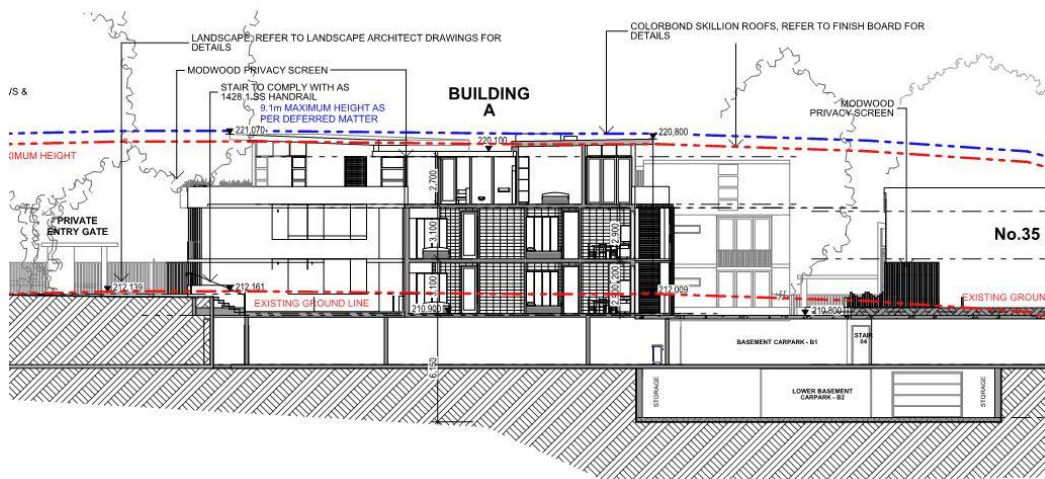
Section J-J above showing that variation to the Height of Building control only occurs at the skillion roof component of the butterfly roof structure. The flat roof component at the gutter, fully complies with the Height of Building control and is at 8.01 m.
